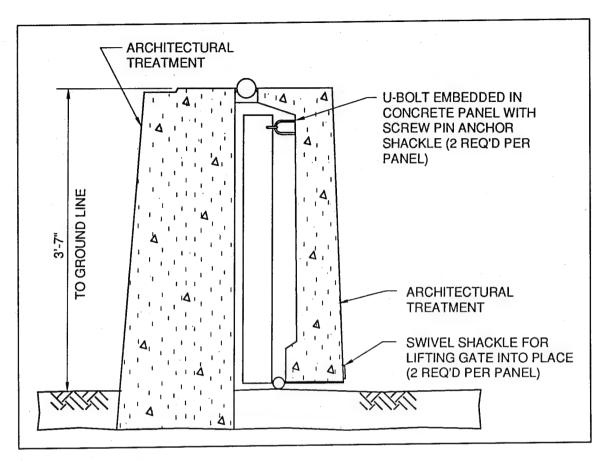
Typical wall section folded position, Bettendorf Floodwall
